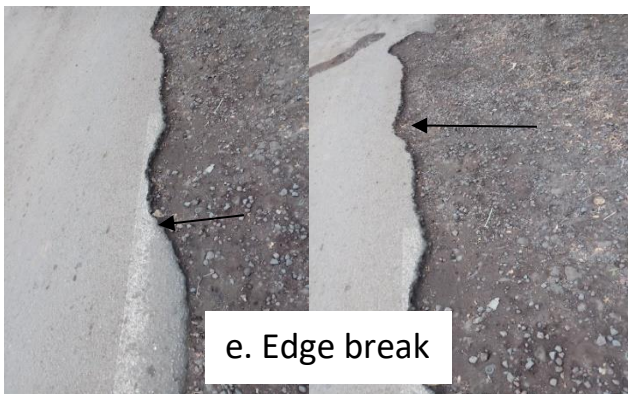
edge break: Defects on RTI along the Olembe-Nkometou 1, stretch of road.
